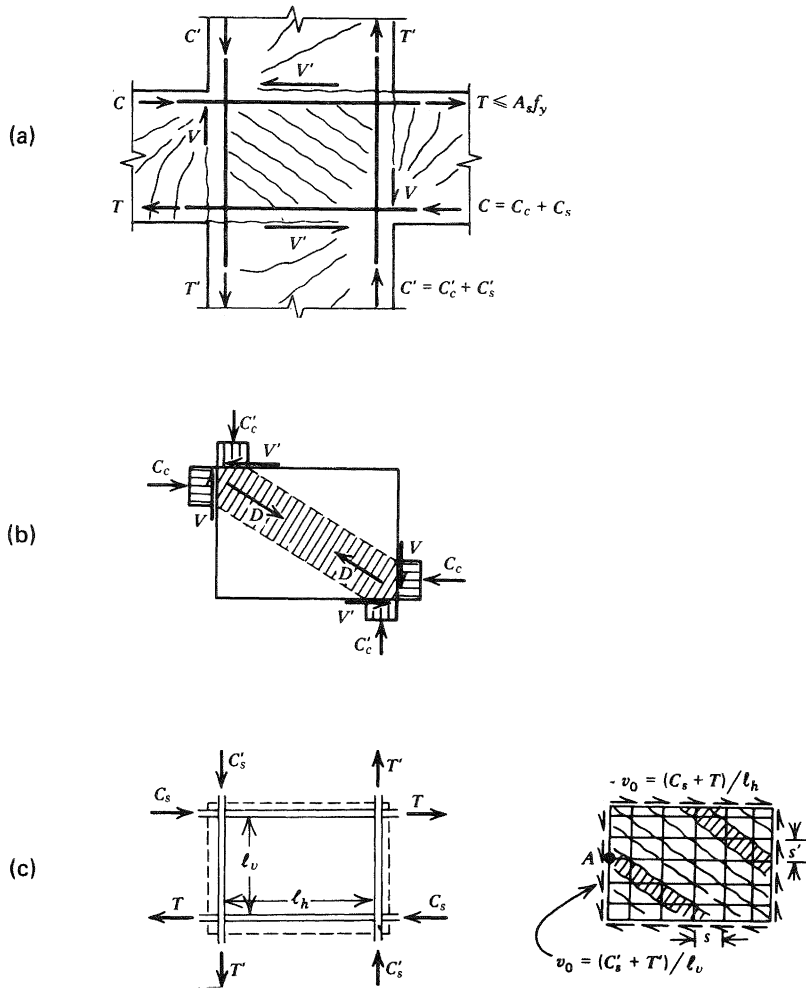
Idealized Behaviour of Reinforced Concrete Interior Beam-Column Joint: (a) Internal Actions and Crack Pattern, (b) Shear Transfer of Concrete Compression Forces by Diagonal Compression Strut Mechanism, and (c) Shear Transfer of Reinforcement Forces by Truss Mechanism (6)
